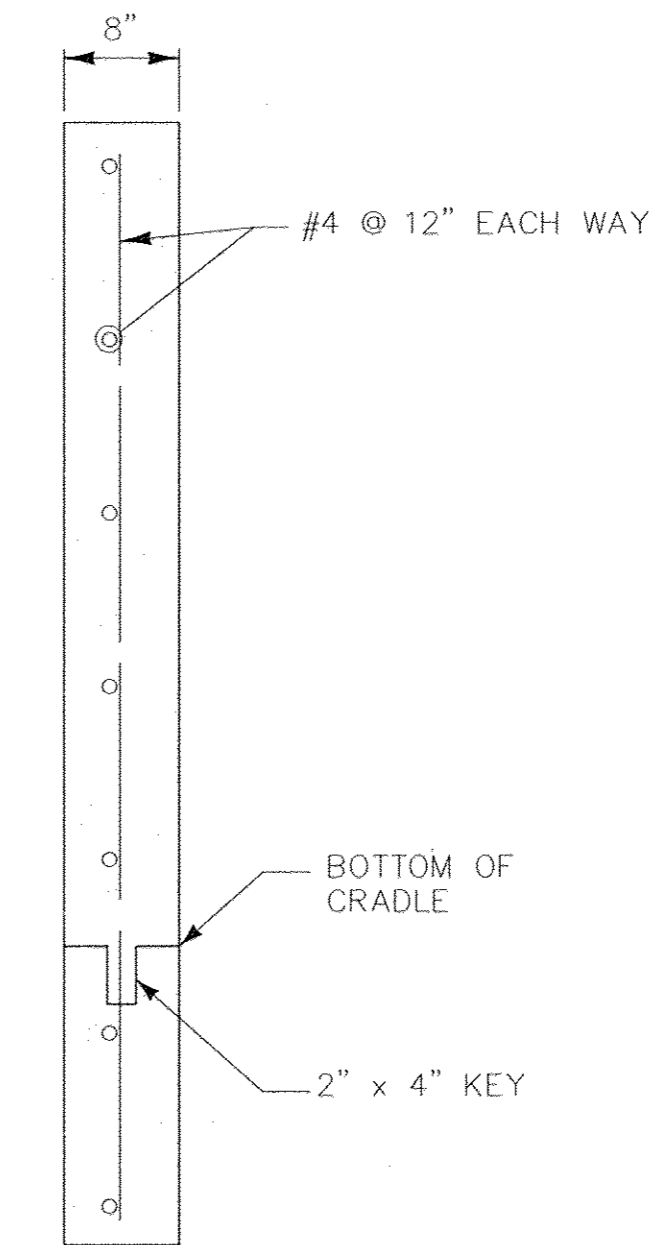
DETAIL SHOWN FOR EARTH FOUNDATION. FOR ROCK FOUNDATION, FOUND BOTTOM OF CRADLE ON ROCK LINE AND KEY COLLAR 6" INTO ROCK.
